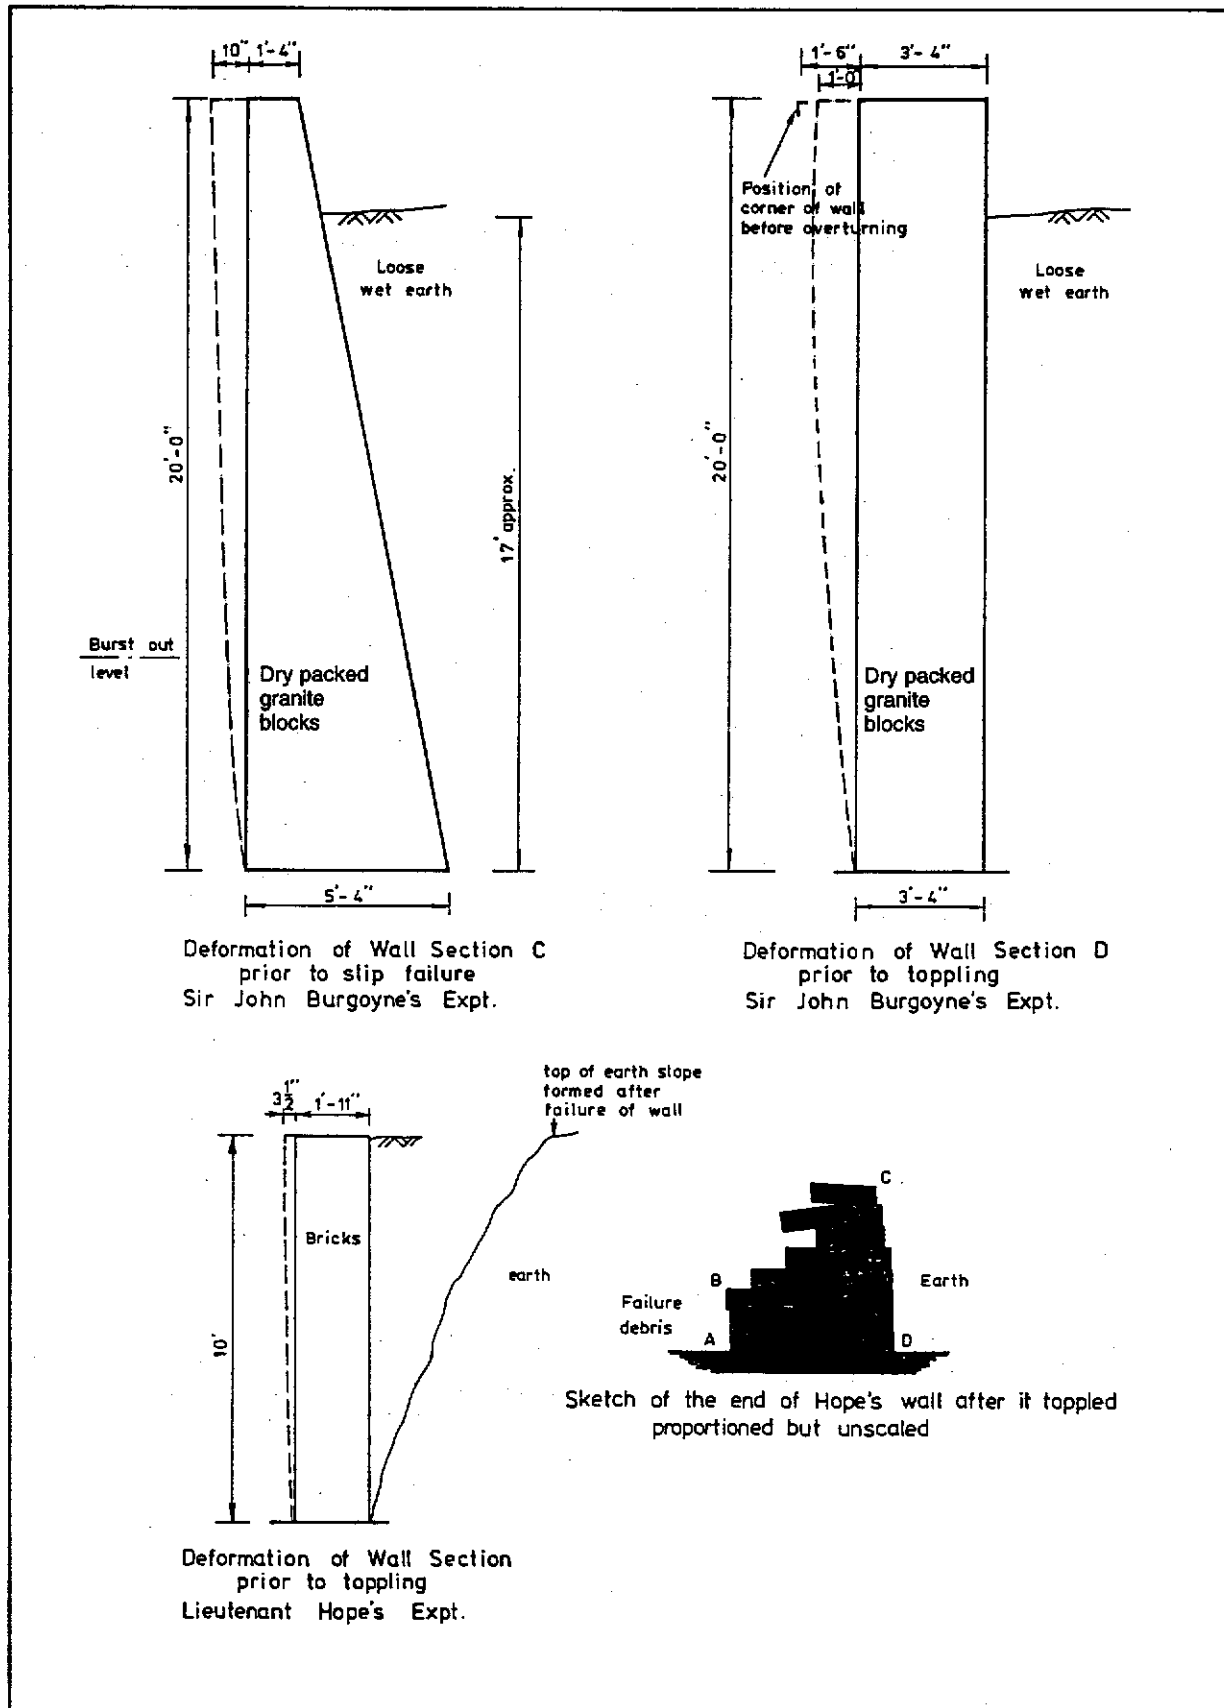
Deformation of Masonry Retaining Walls Prior the Failures - Experiments by Burgoyne and Hope
